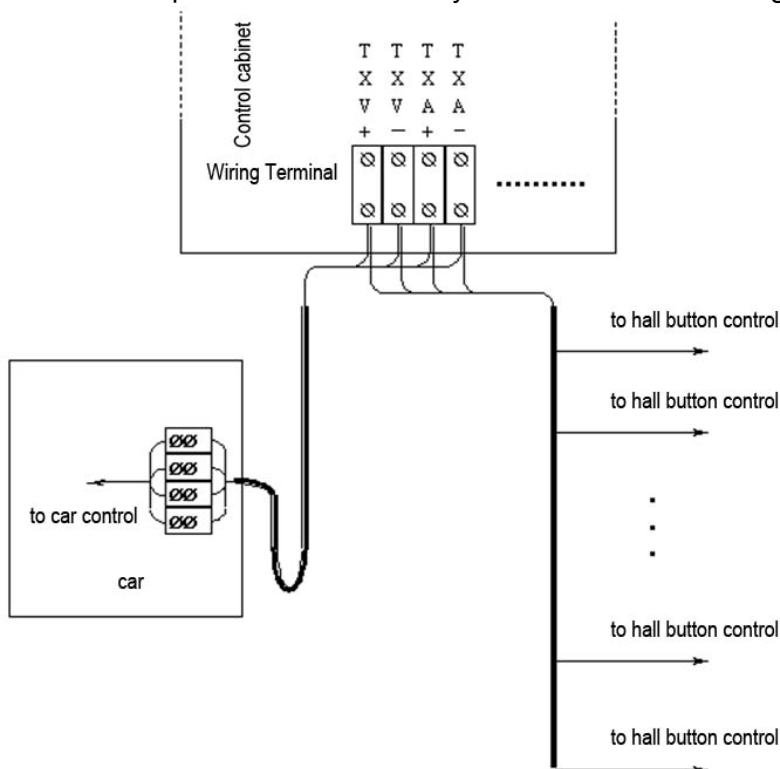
Elevator Shaft and Trailing Cable Wiring Sketch
